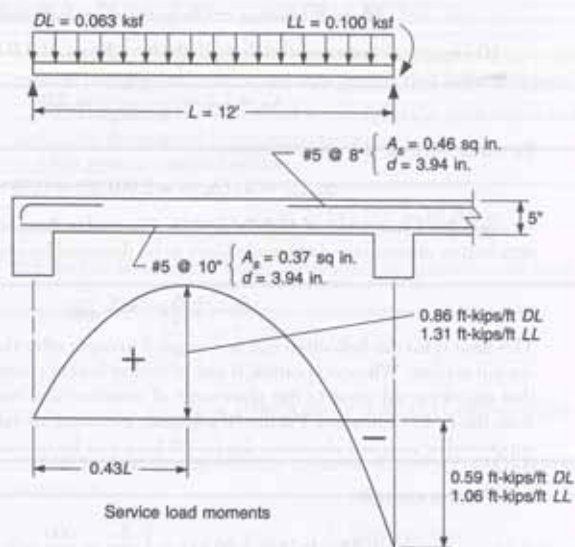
End-span details for continuous slab Example 14.12.2.
